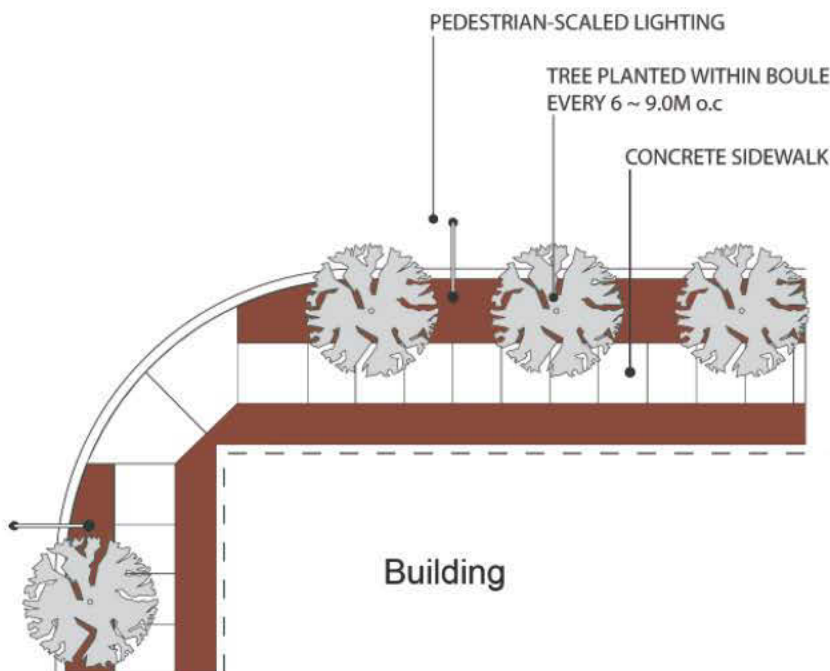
A potential corner plan that incorporates site details to enhance the pedestrian experience.
